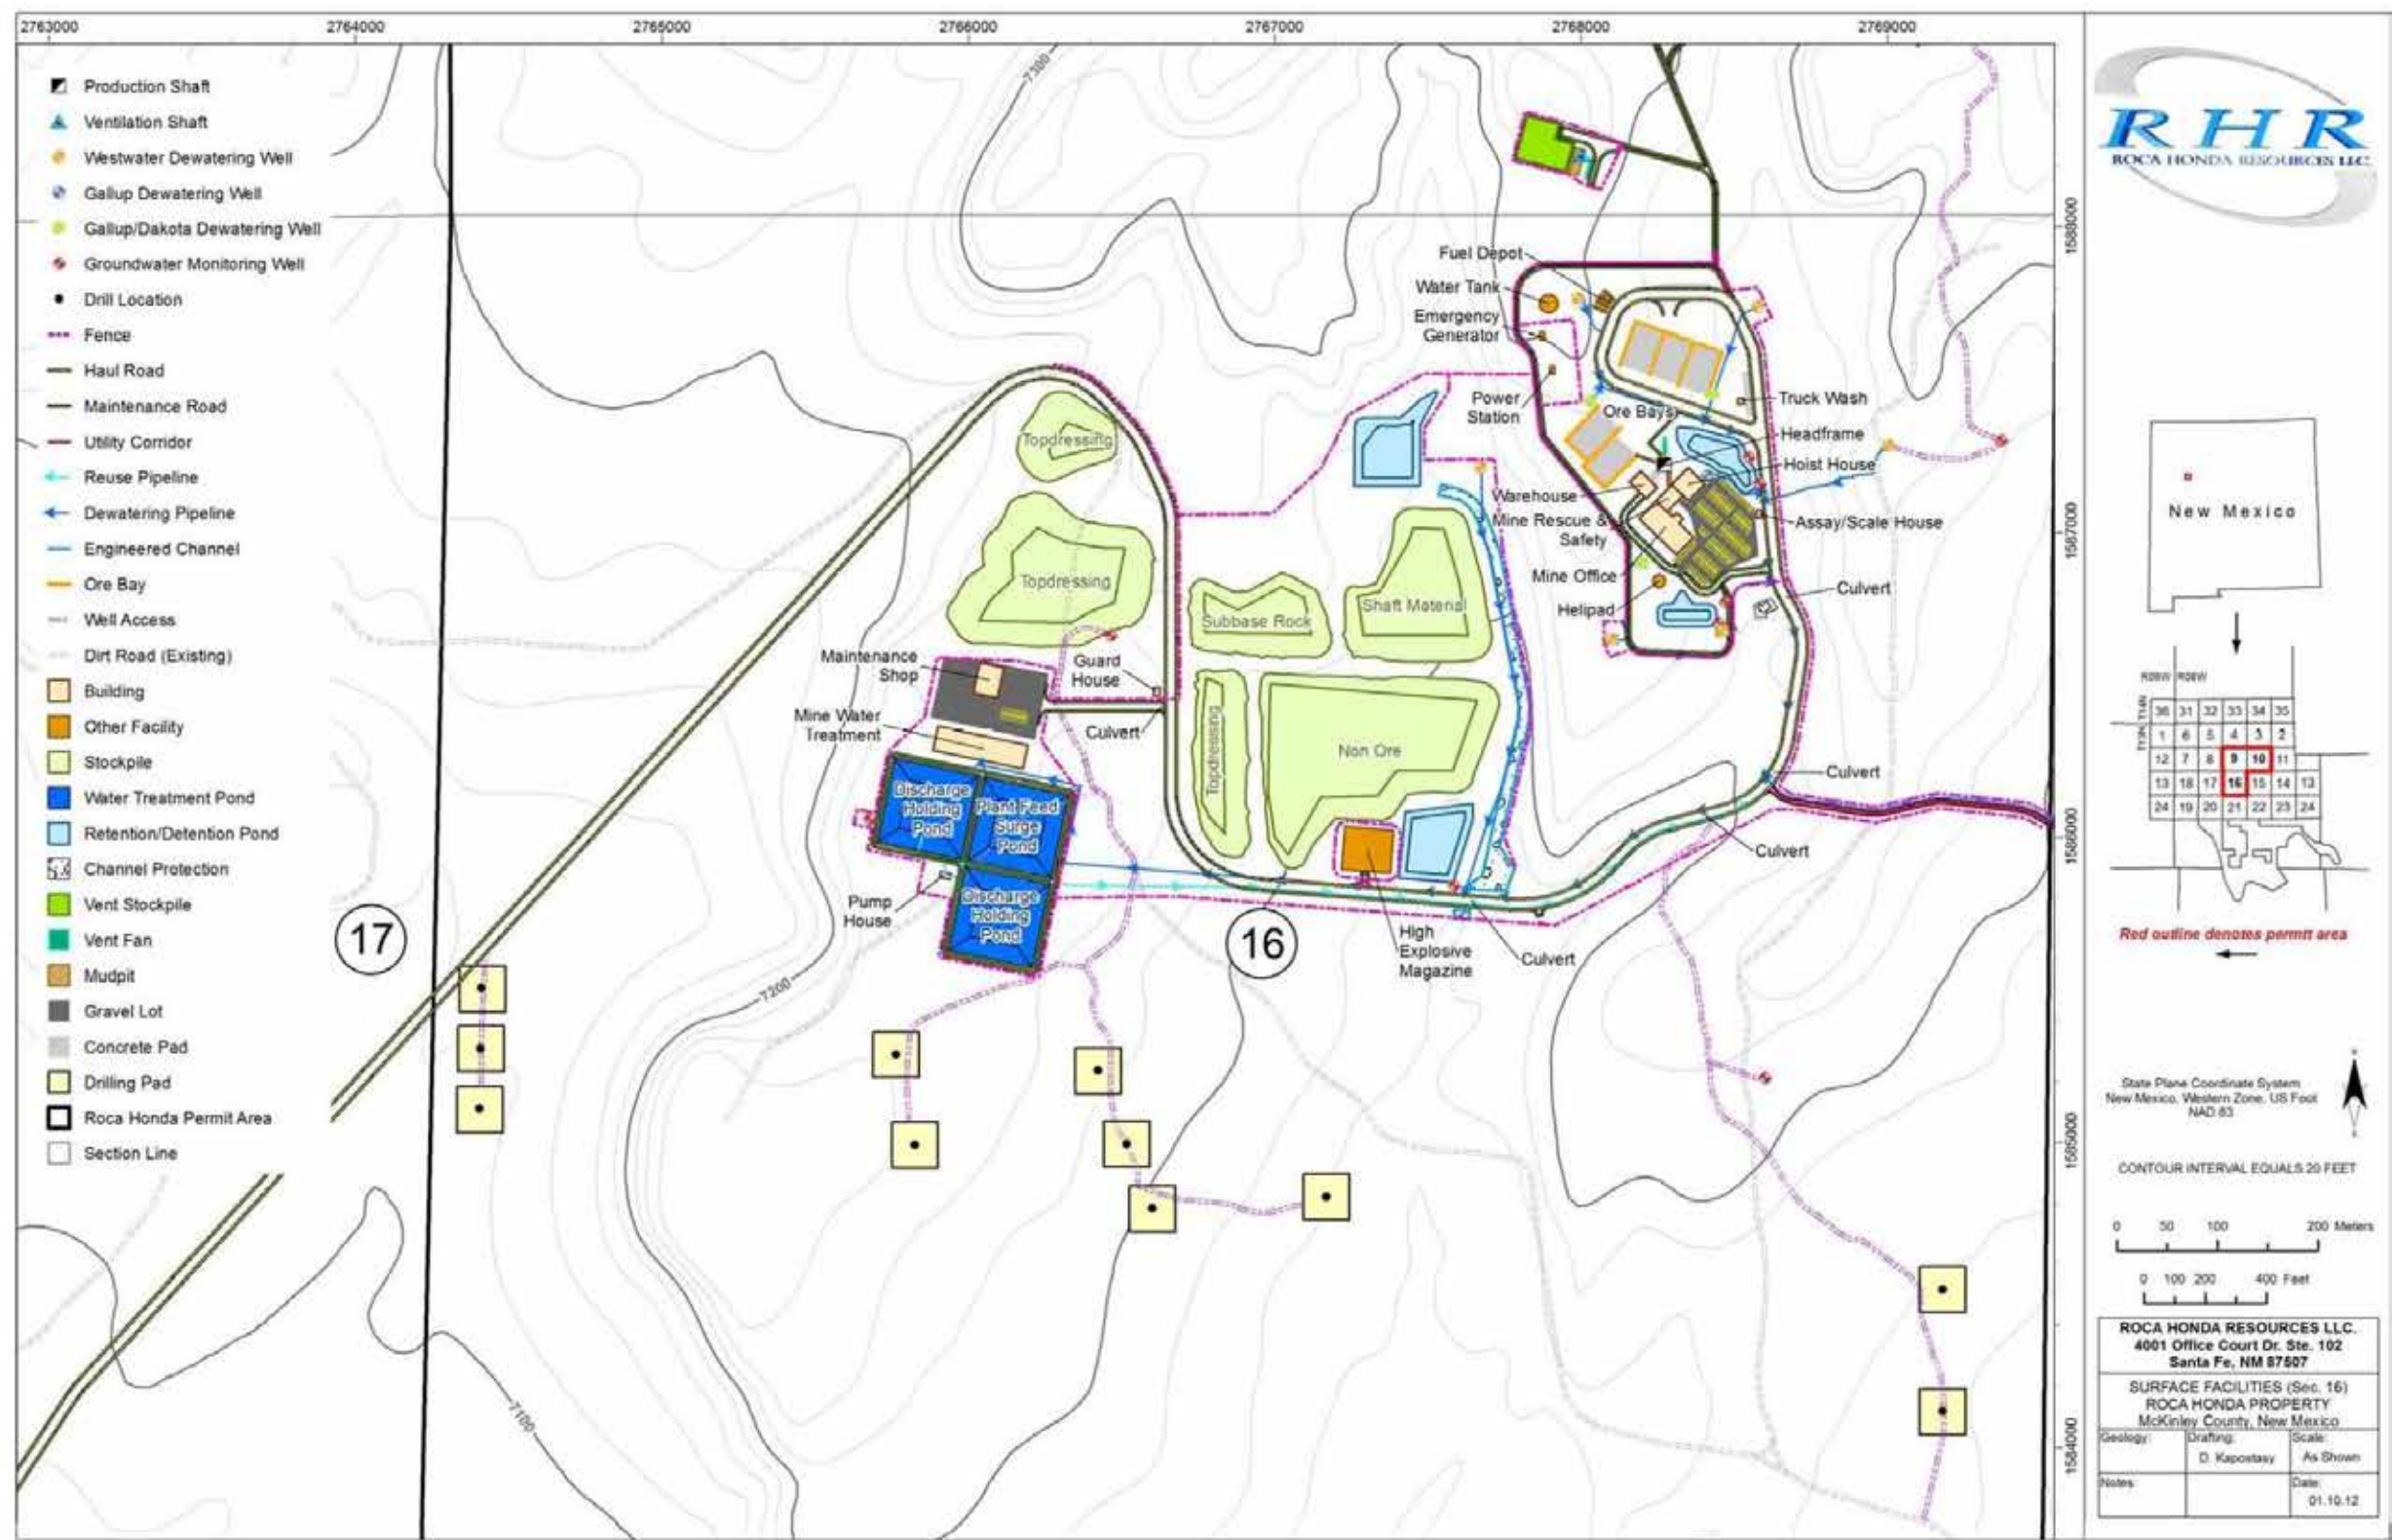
Layout of surface facilities in Section 16 for the proposed Roca Honda Mine
